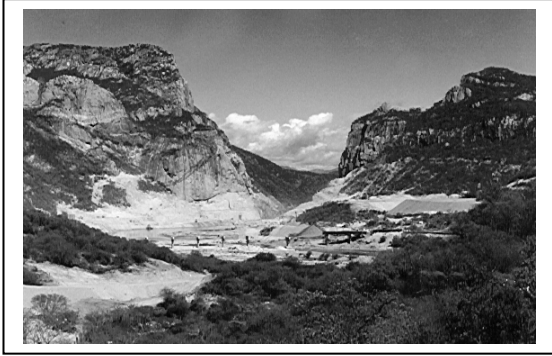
Project site before the dam construction (la “boquilla”-gorge)
